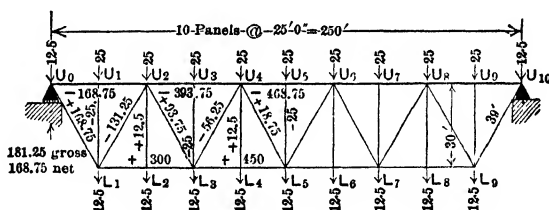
Dead panel loads and index stresses. Single-track deck subdivided Warren truss railroad bridge.
